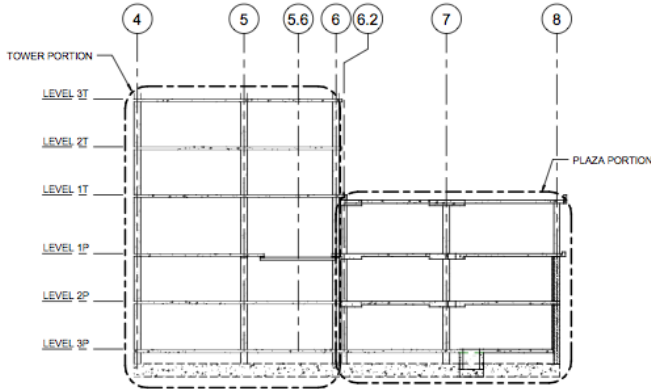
Elevation showing location of expansion joint and relationship between Plaza portion and Tower portion
